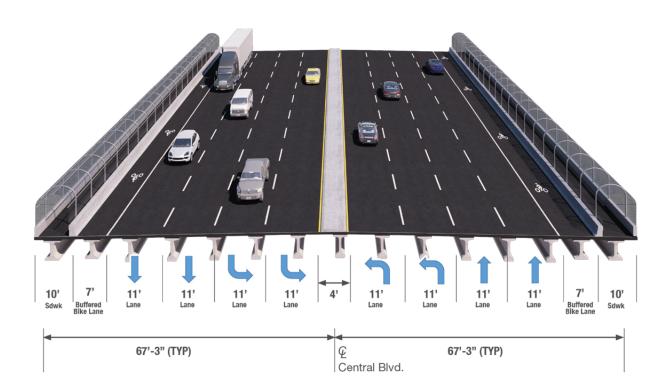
Proposed Typical Section - Central Blvd. East of I-95 - TDUI
